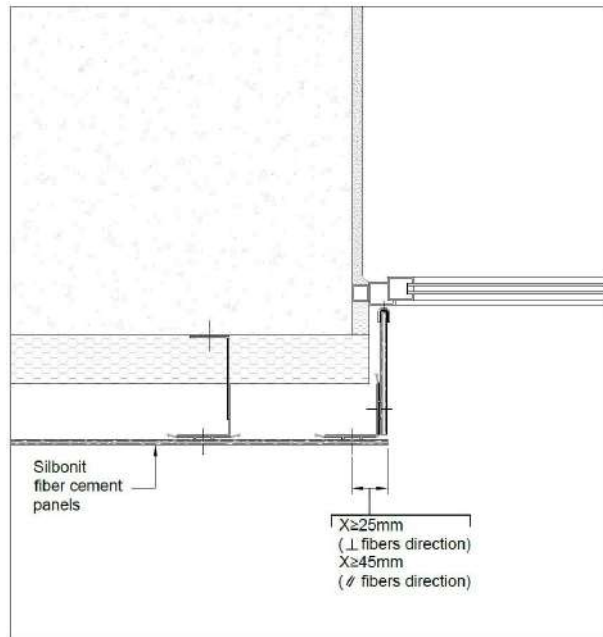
Example of horizontal section of a ventilated facade along a window. Aluminum subframe.
